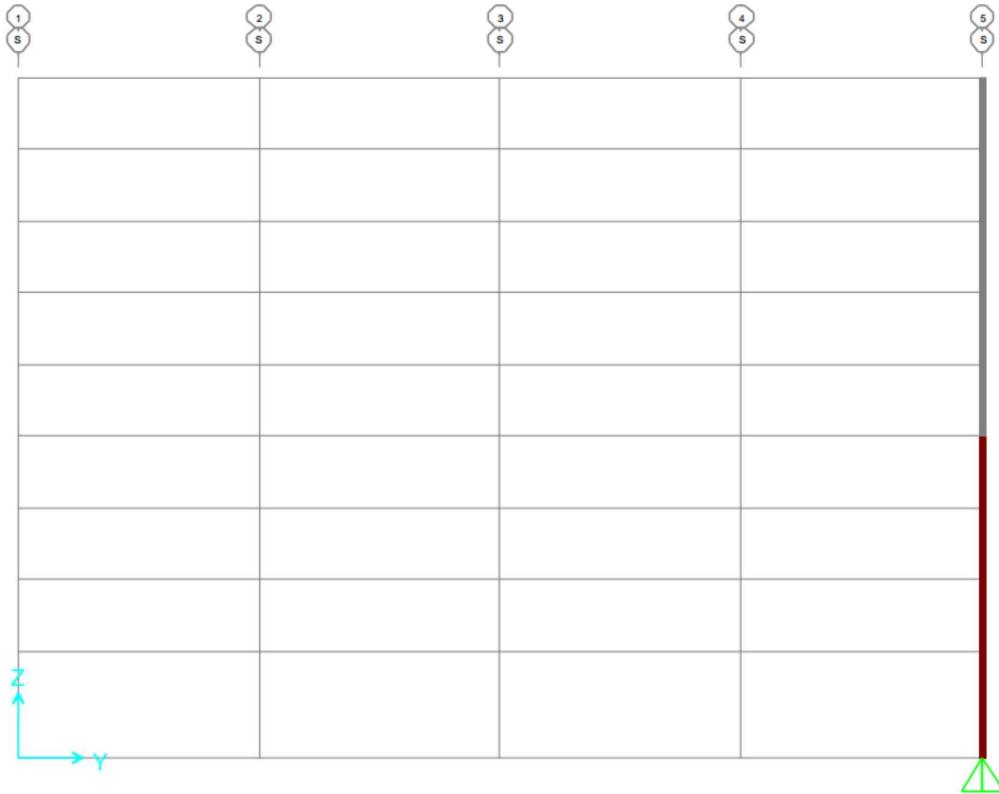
Column cross-section layout in the face S (SAP2000)
